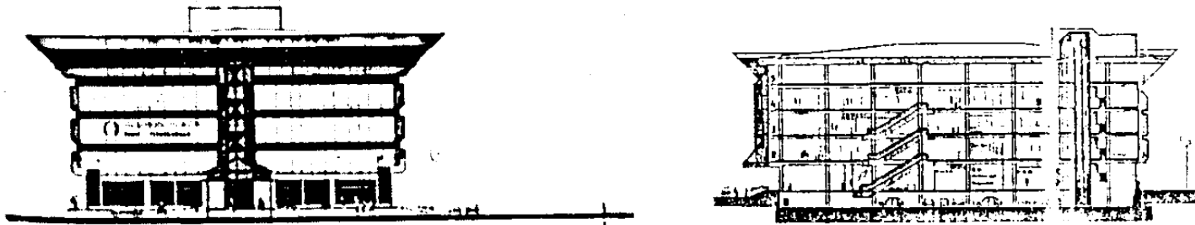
Elevation and section of the five-storey shopping centre at Blok M, designed by Rusjdi and Warman.
